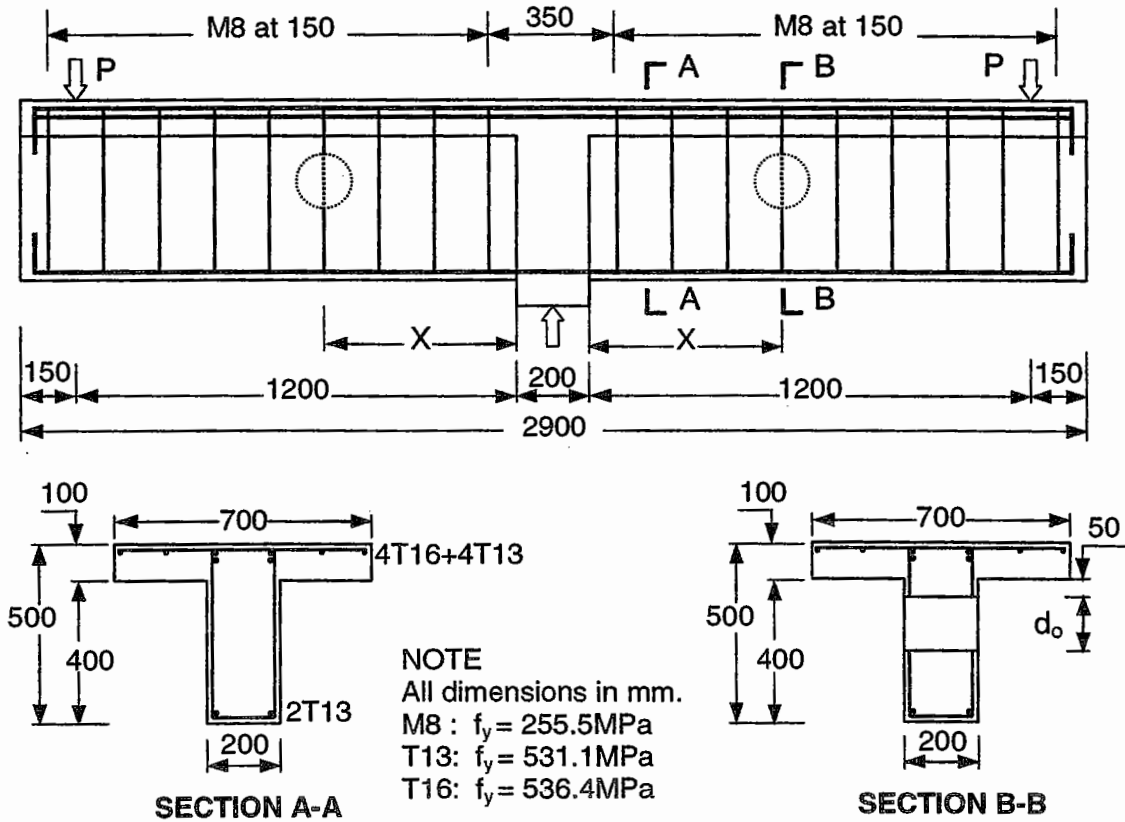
Reinforcement details of beams (Weng, 1998).
